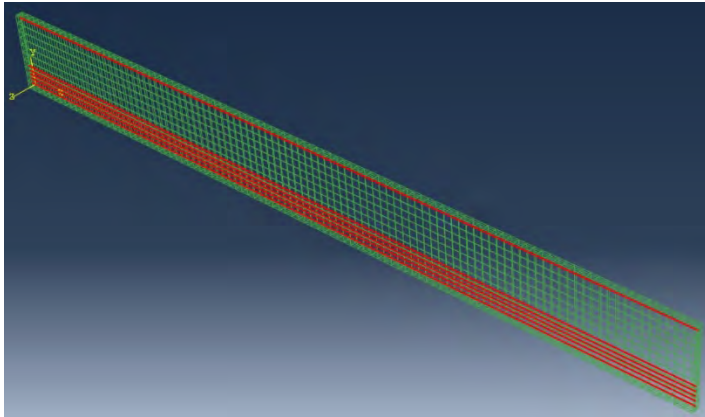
Model with Primary Longitudinal Steel Reinforcement.
